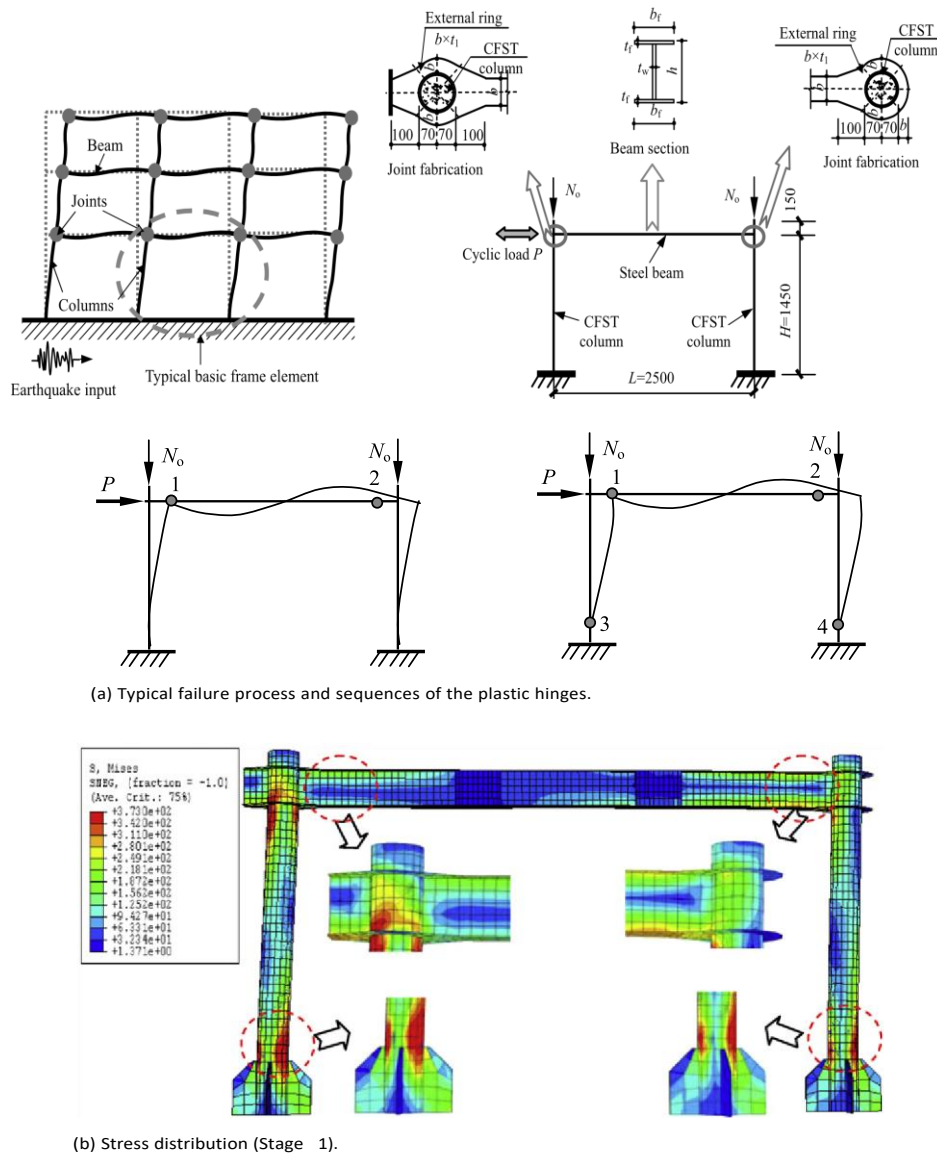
Schematic View of Frame Models and Failure Modes (Han et al. 2011)
